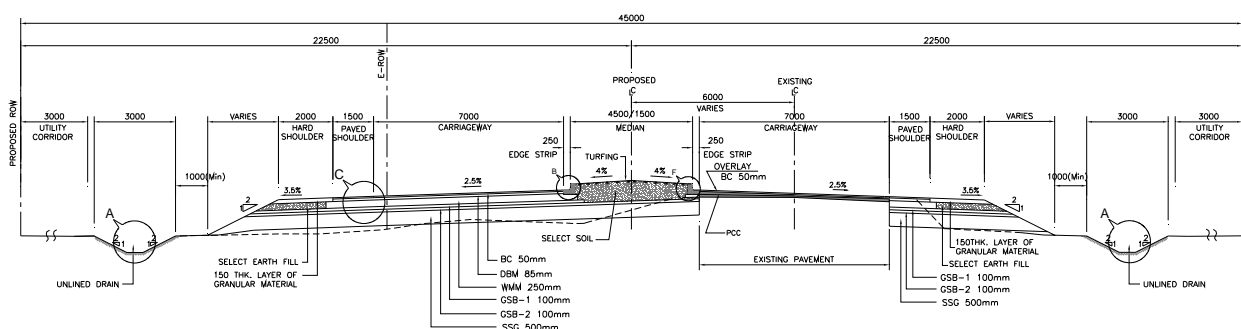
TYPICAL CROSS SECTION FOR LEFT HAND SIDE WIDENING IN RURAL AREA
